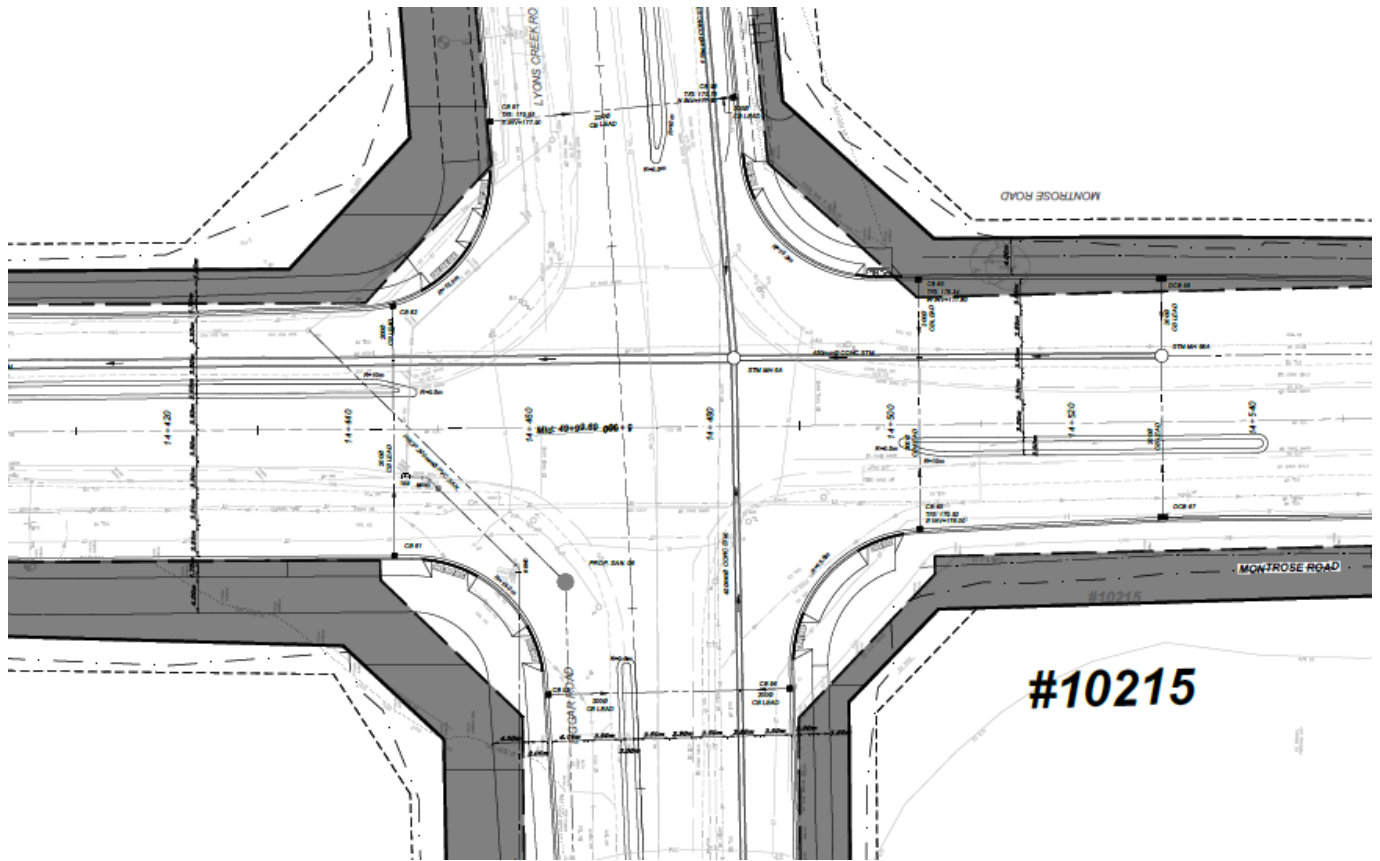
WIDENED AND IMPROVED MONTROSE ROAD / LYONS CREEK ROAD INTERSECTION
